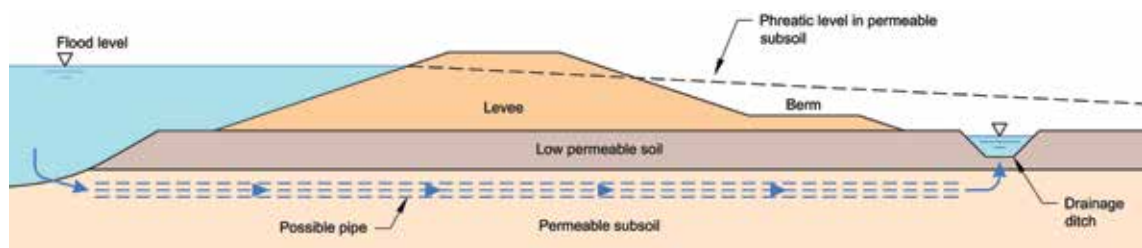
Hydraulic failure (ULS HYD): conditions that might cause piping (after BS EN1997-1:2004)
